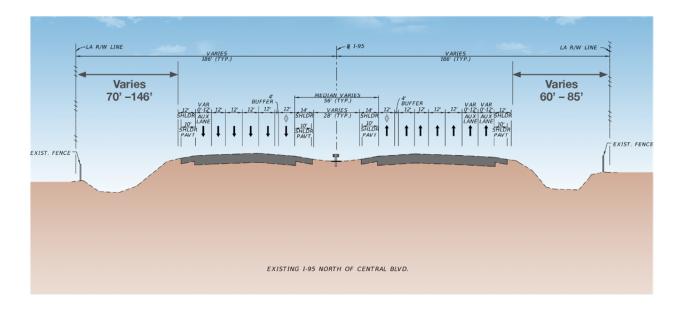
Existing I-95 Roadway Typical Section - North of Central Boulevard
